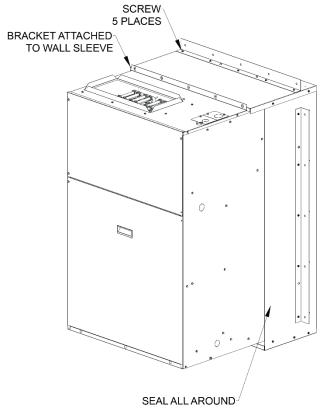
Top Mounting Bracket Installation on Wall Sleeve
